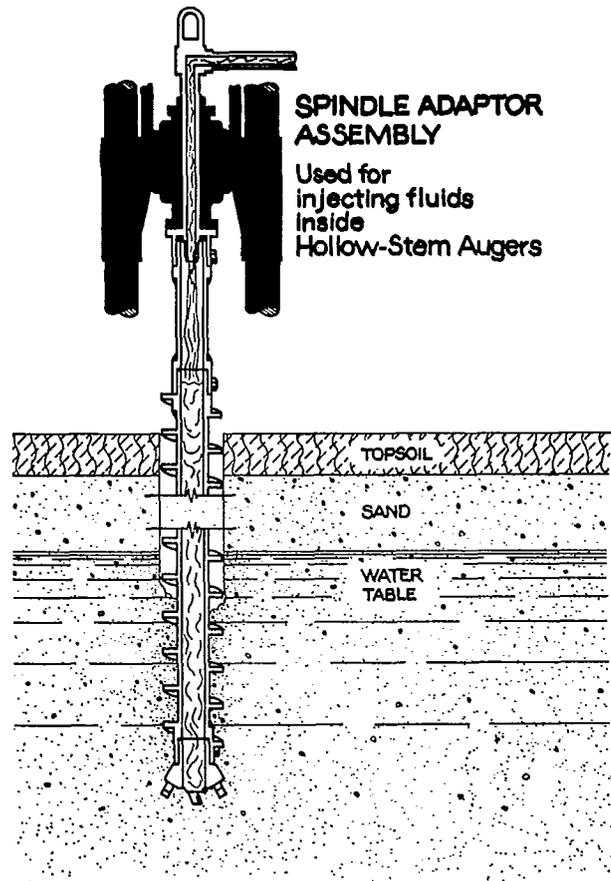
Injecting Drilling Fluid Through a Hollow-Stem Auger with a Spindle Adaptor. (Courtesy Central Mine Equipment Co.)
